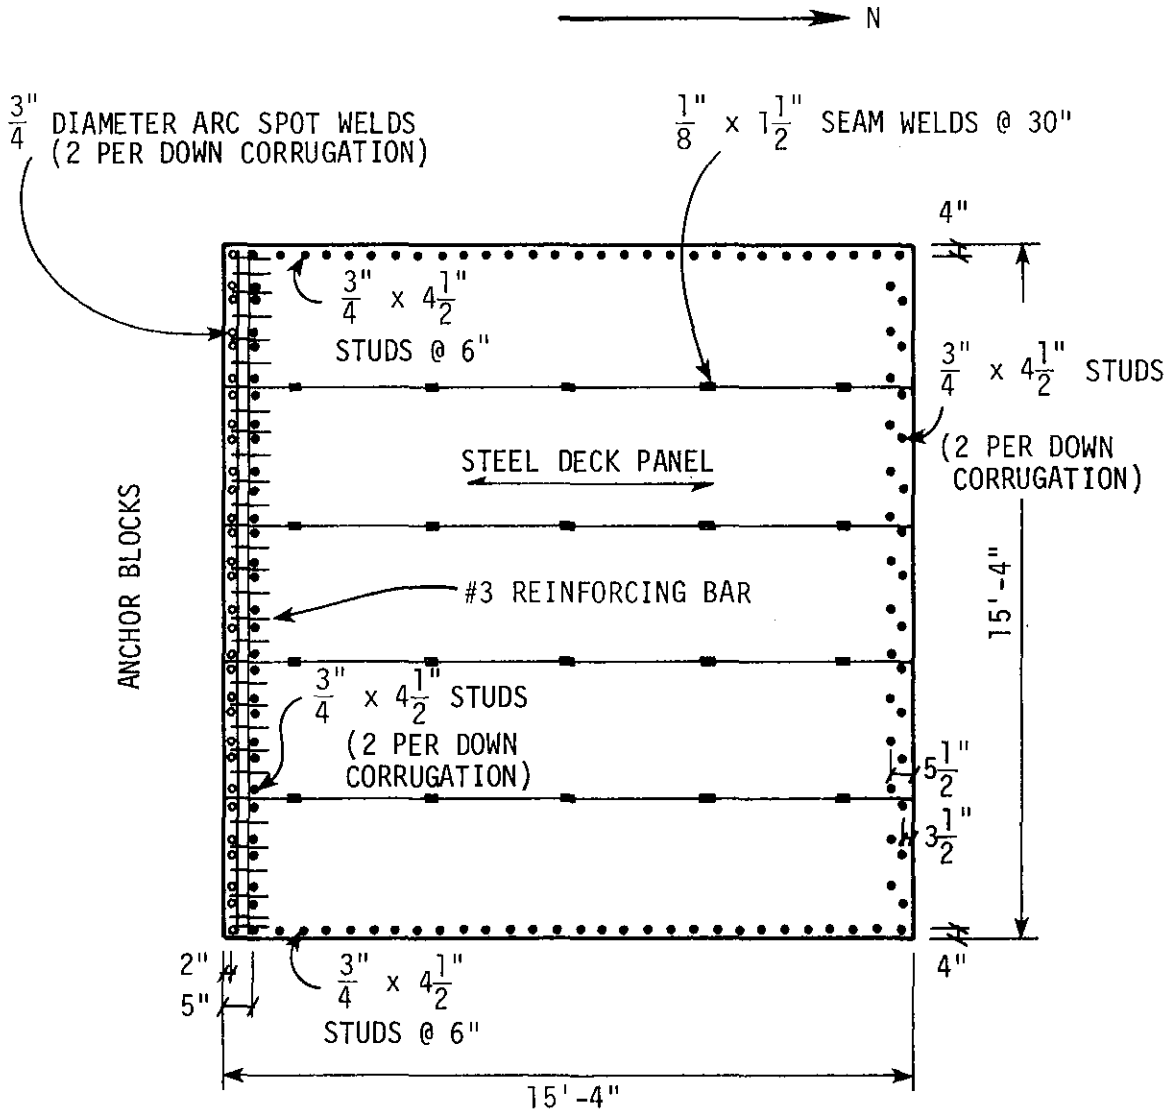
Detailed plan view of pilot test Specimens 1 and 2.
